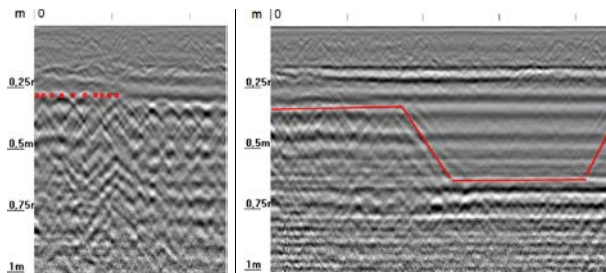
GPR scans of the bridge slab across the road above the pillar (left) and along the road at the kerb (right). The layout of the main reinforcement bars is shown in red
